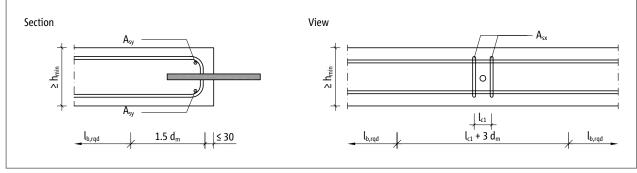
Schöck Dorn type LD: On-site reinforcement
